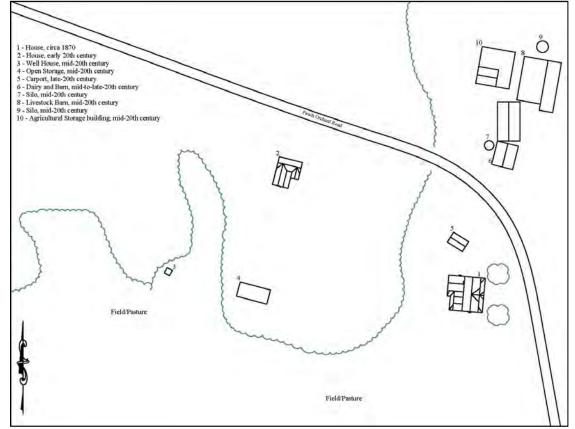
Site plan of the Henry Wallace House property (CA0597).
